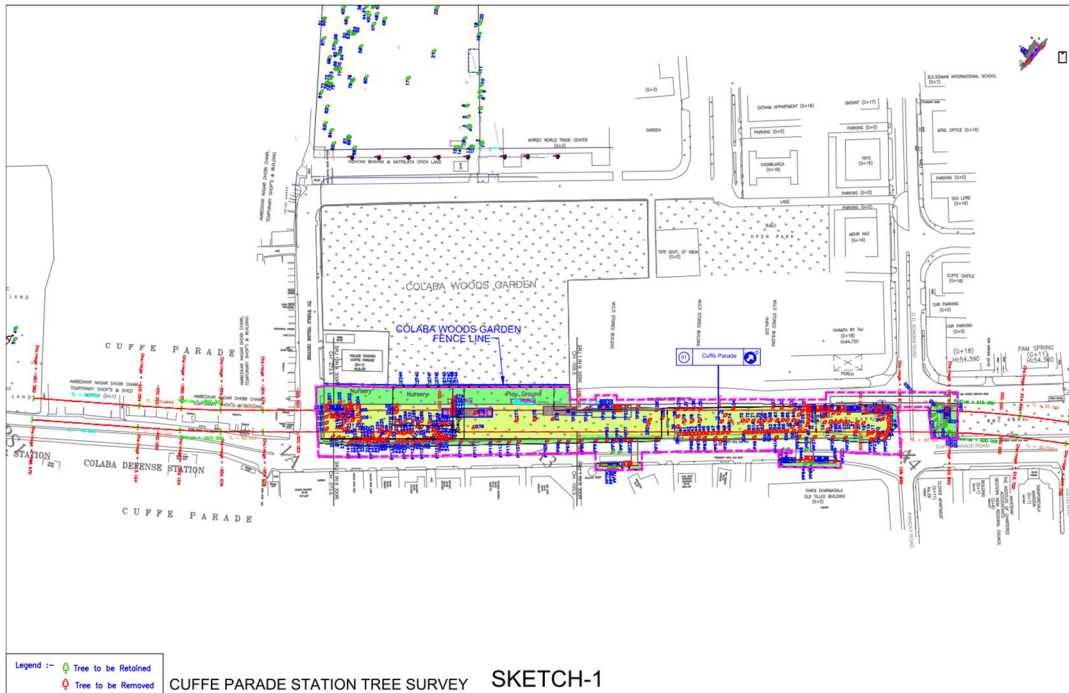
Figure Showing the Colaba Woods Garden fence line and construction works areas
